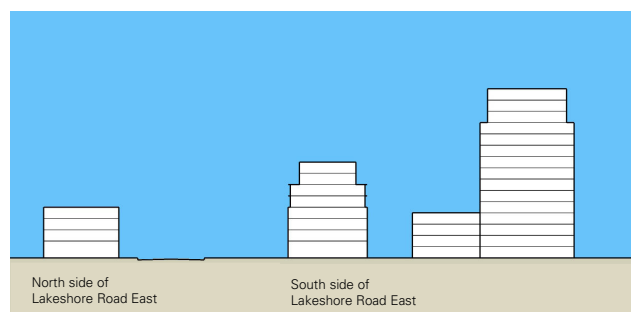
Development in the Lakeview Waterfront along Lakeshore Road East with an 8 storey building and a 15 storey building behind.
